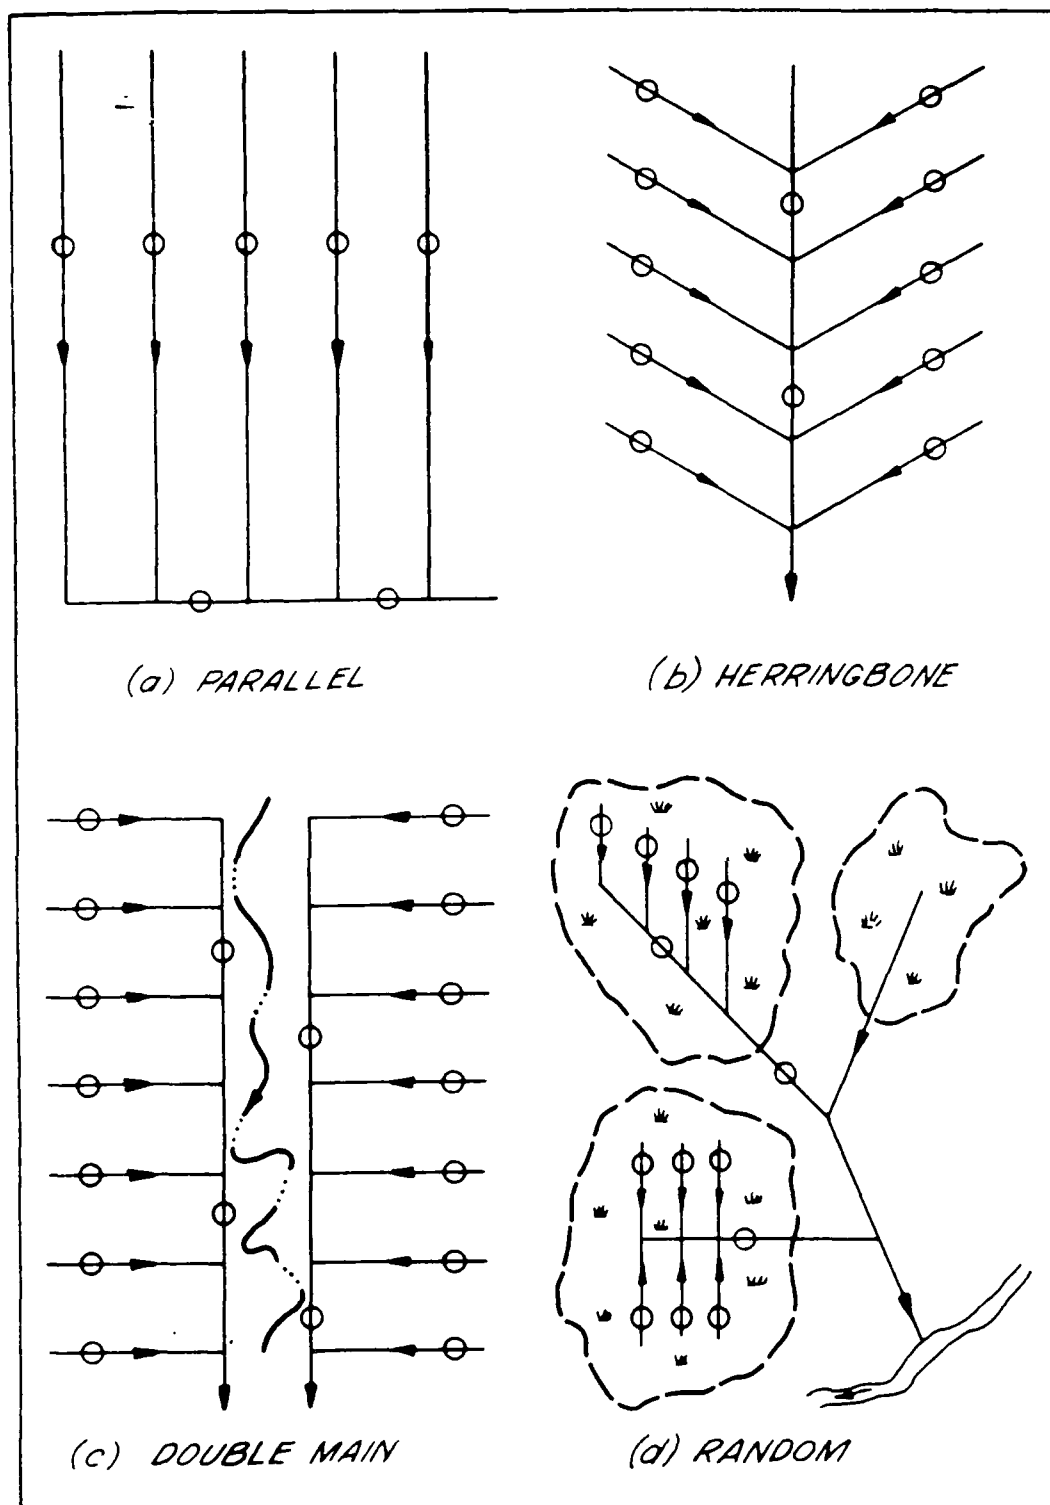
Relief drainage systems for subsurface drainage. (Source: USDA Soil Conservation Service National Engineering Handbook, Section 16, "Drainage of Agricultural Land" [USDA Soil Conservation Service, Washington, DC, 1971], p 4-23.)
